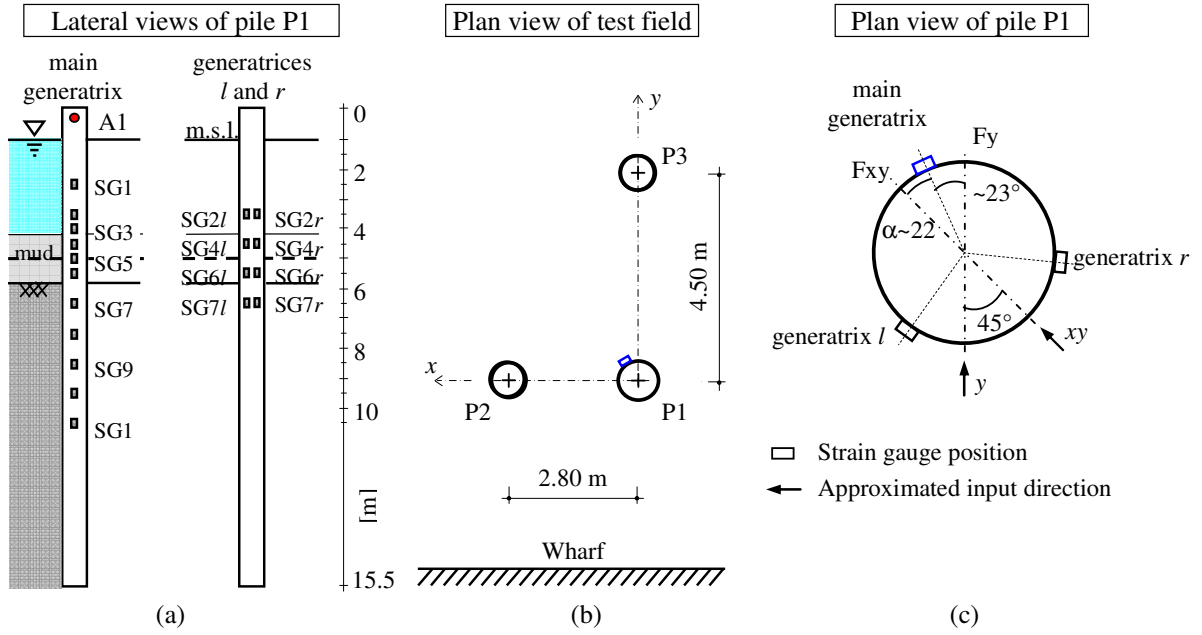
(a) Pile P1 instrumentation; (b) plan view of test field; (c) plan view of pile P1
